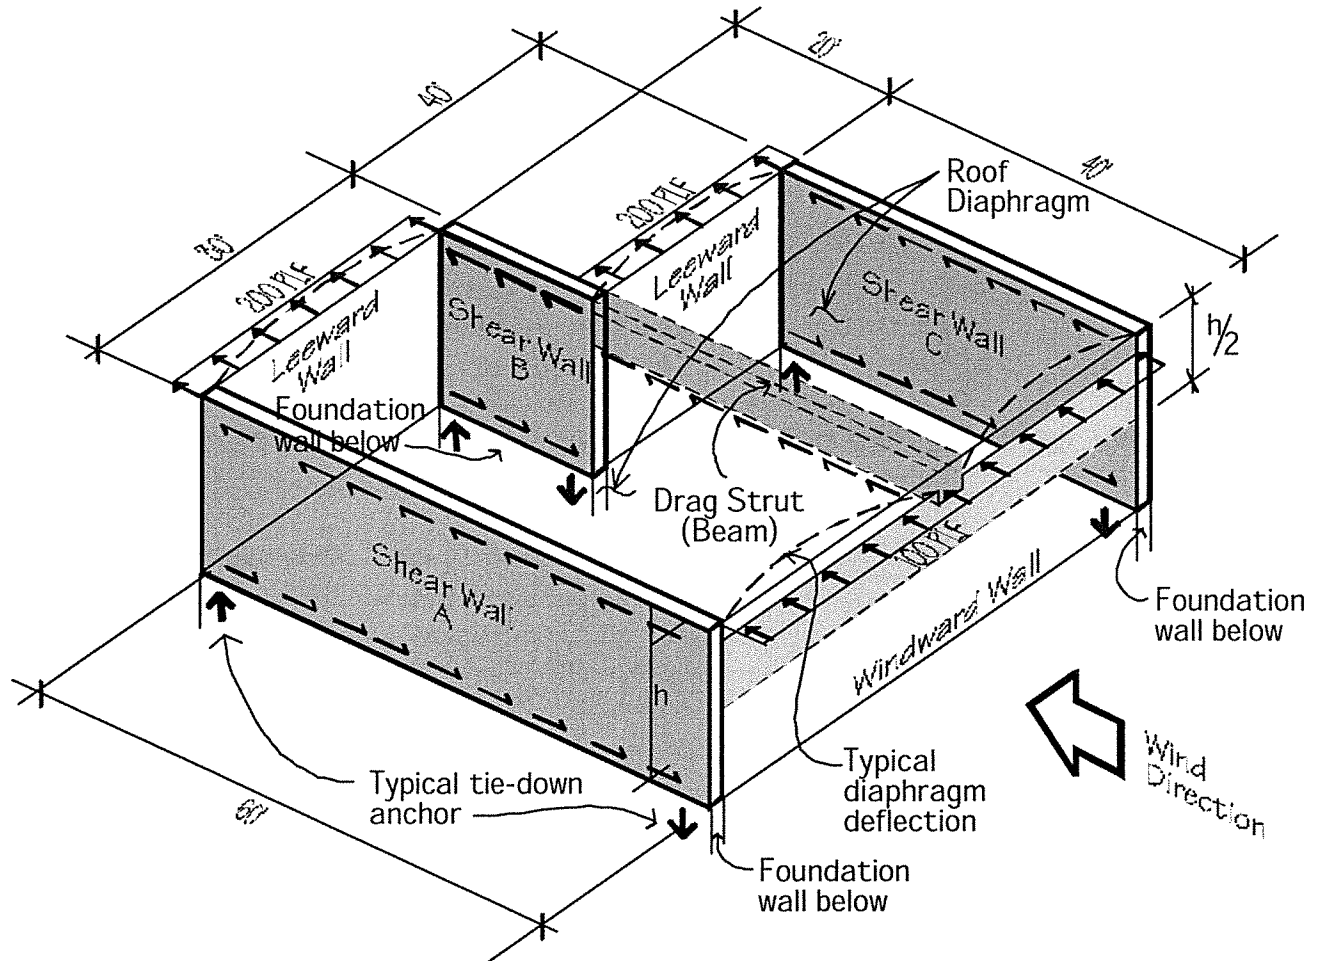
Diaphragm Load Transfer in a One Story Residence
